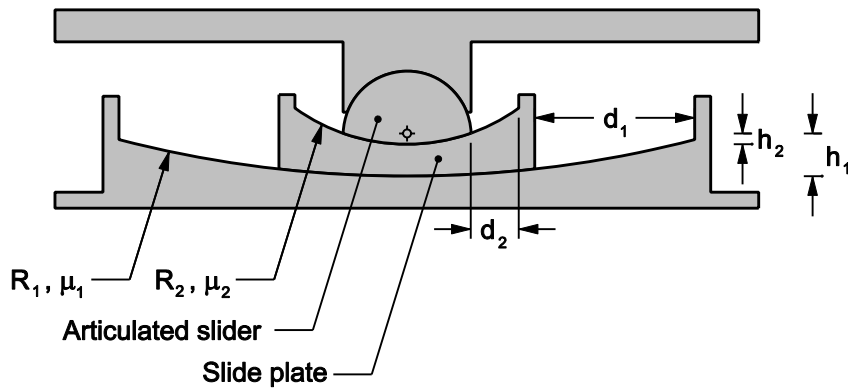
Cross Section of the Modified Single FP Bearing
